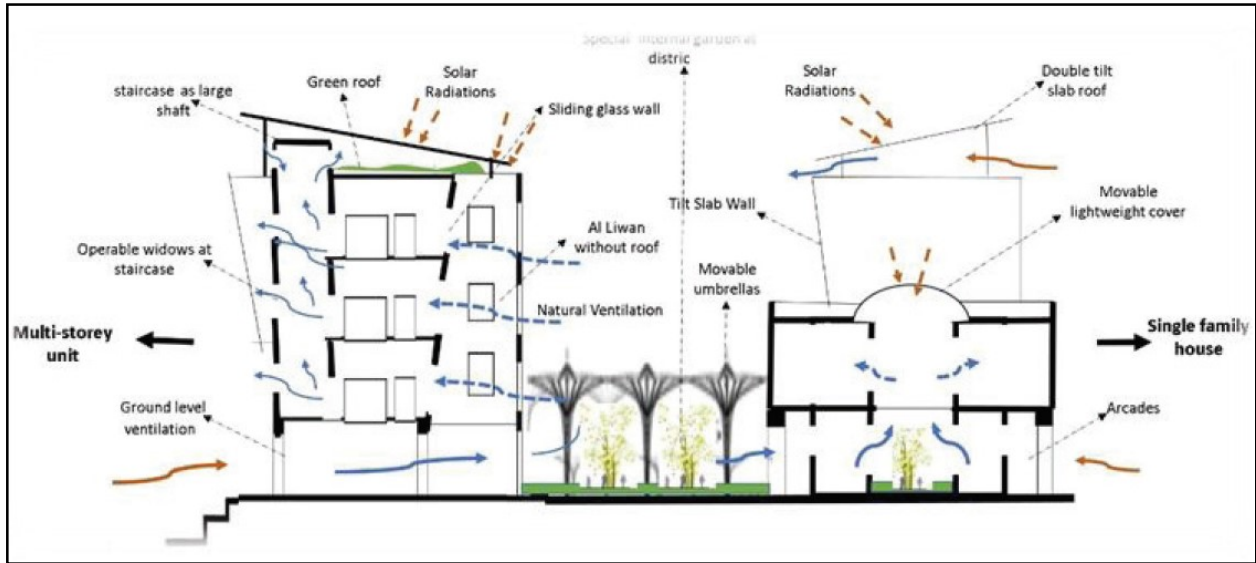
The section shows the new inspire Ventilation Systems for the new residential building at the old city of Aleppo. Source: (Salkini et al., 2017) Accessed: 26-1-2021
